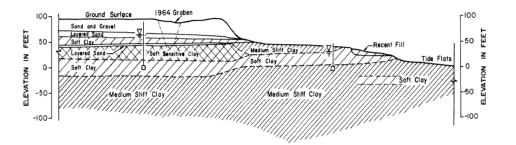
SOIL CONDITIONS IN L-STREET SLIDE AREA, ANCHORAGE.
